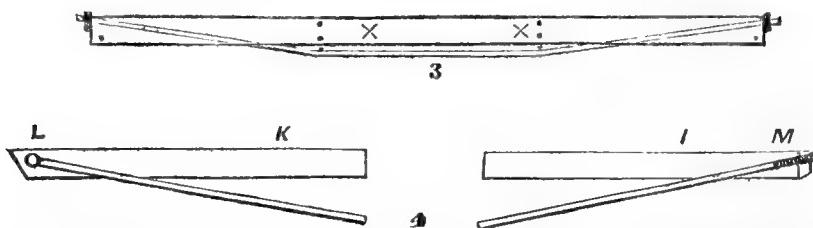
TRUSSSED RIDGE. FIG. 4.—DETAILS, SHOWING APPLICATION OF TRUSS.
